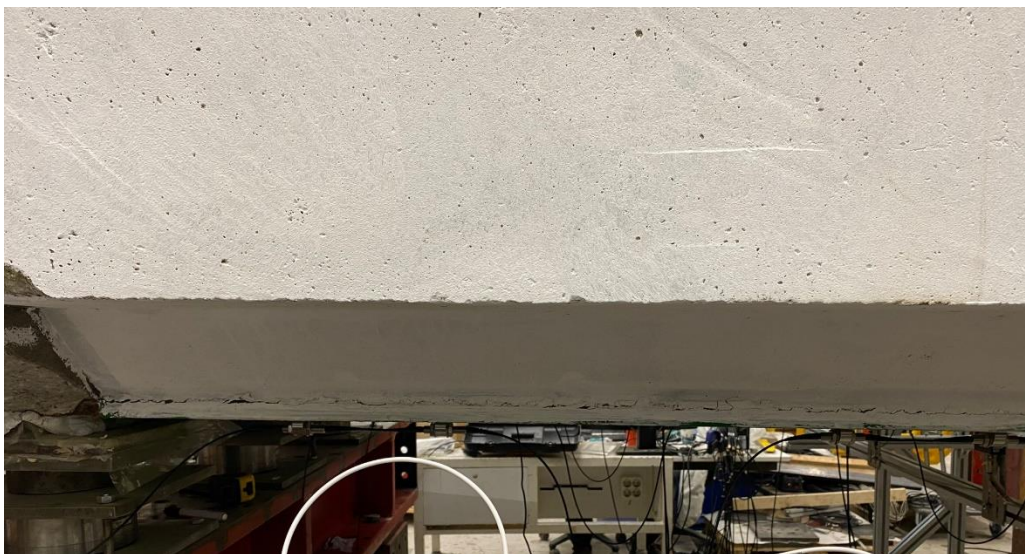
LB1 - Delamination crack observed at Ptotal = 1746 kN. Steel beam 1. Picture from south view.
